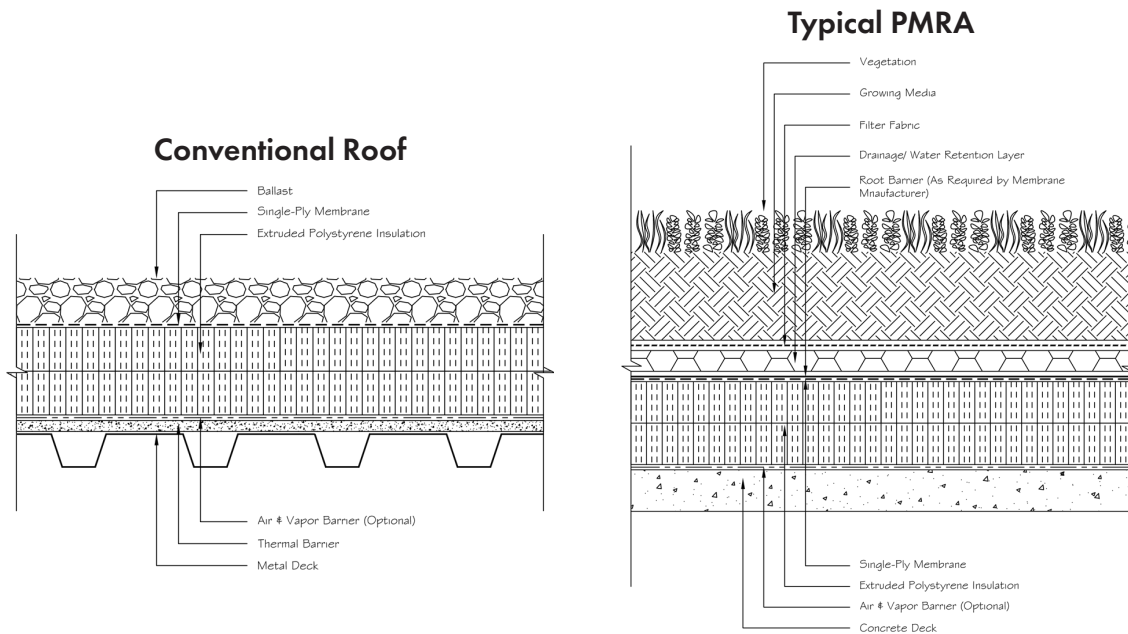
A PMRA is sometimes referred to as a “upside down” roof assembly because XPS insulation boards are placed on top of the roofing membrane. Here a conventional single ply roof assembly on a metal deck (left) is compared with a PMRA (right) including vegetative roof layers. Line drawings courtesy of Owens Corning.
